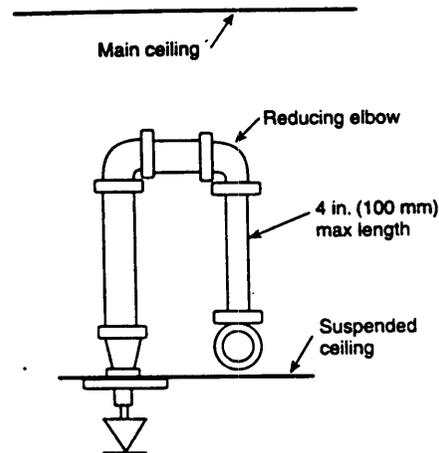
(a) Nipple and reducing elbow supplying sprinkler below ceiling.
